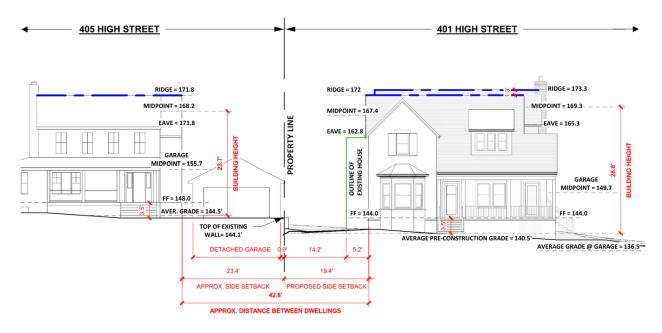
High Street Elevations of Proposed Dwelling with Western Neighboring Property
